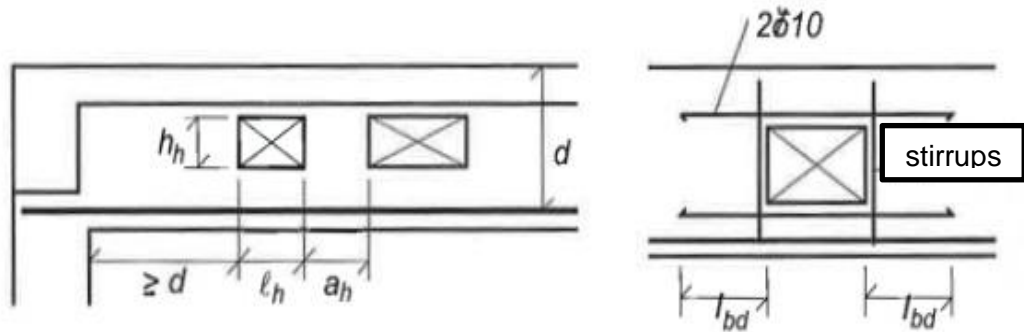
Placement of small openings and additional reinforcements. Modified from Leskelä (2006) [8,384].
